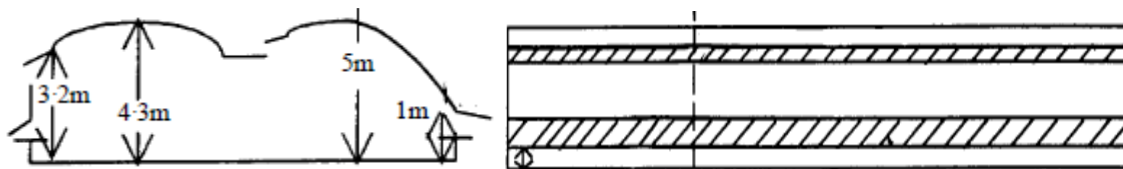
Continuous roof and side ventilation greenhouse (Boulard *et al.*, 1997)
